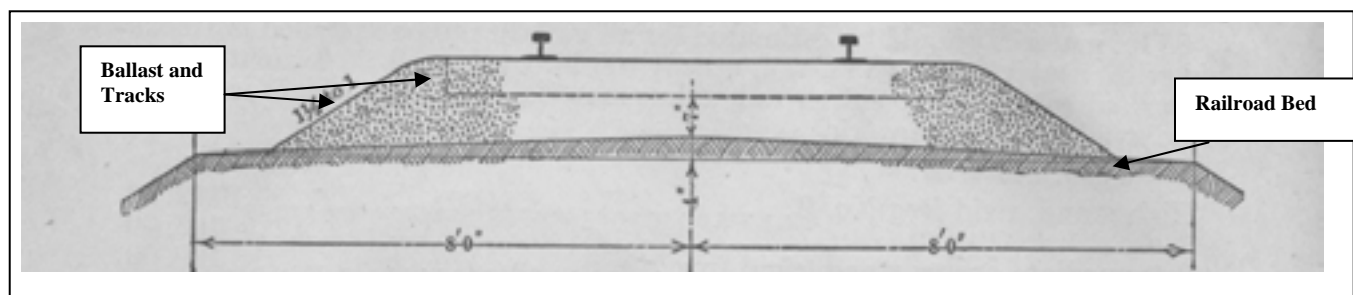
Typical railroad bed, ballast, and tracks (Orrock 1918:14)
